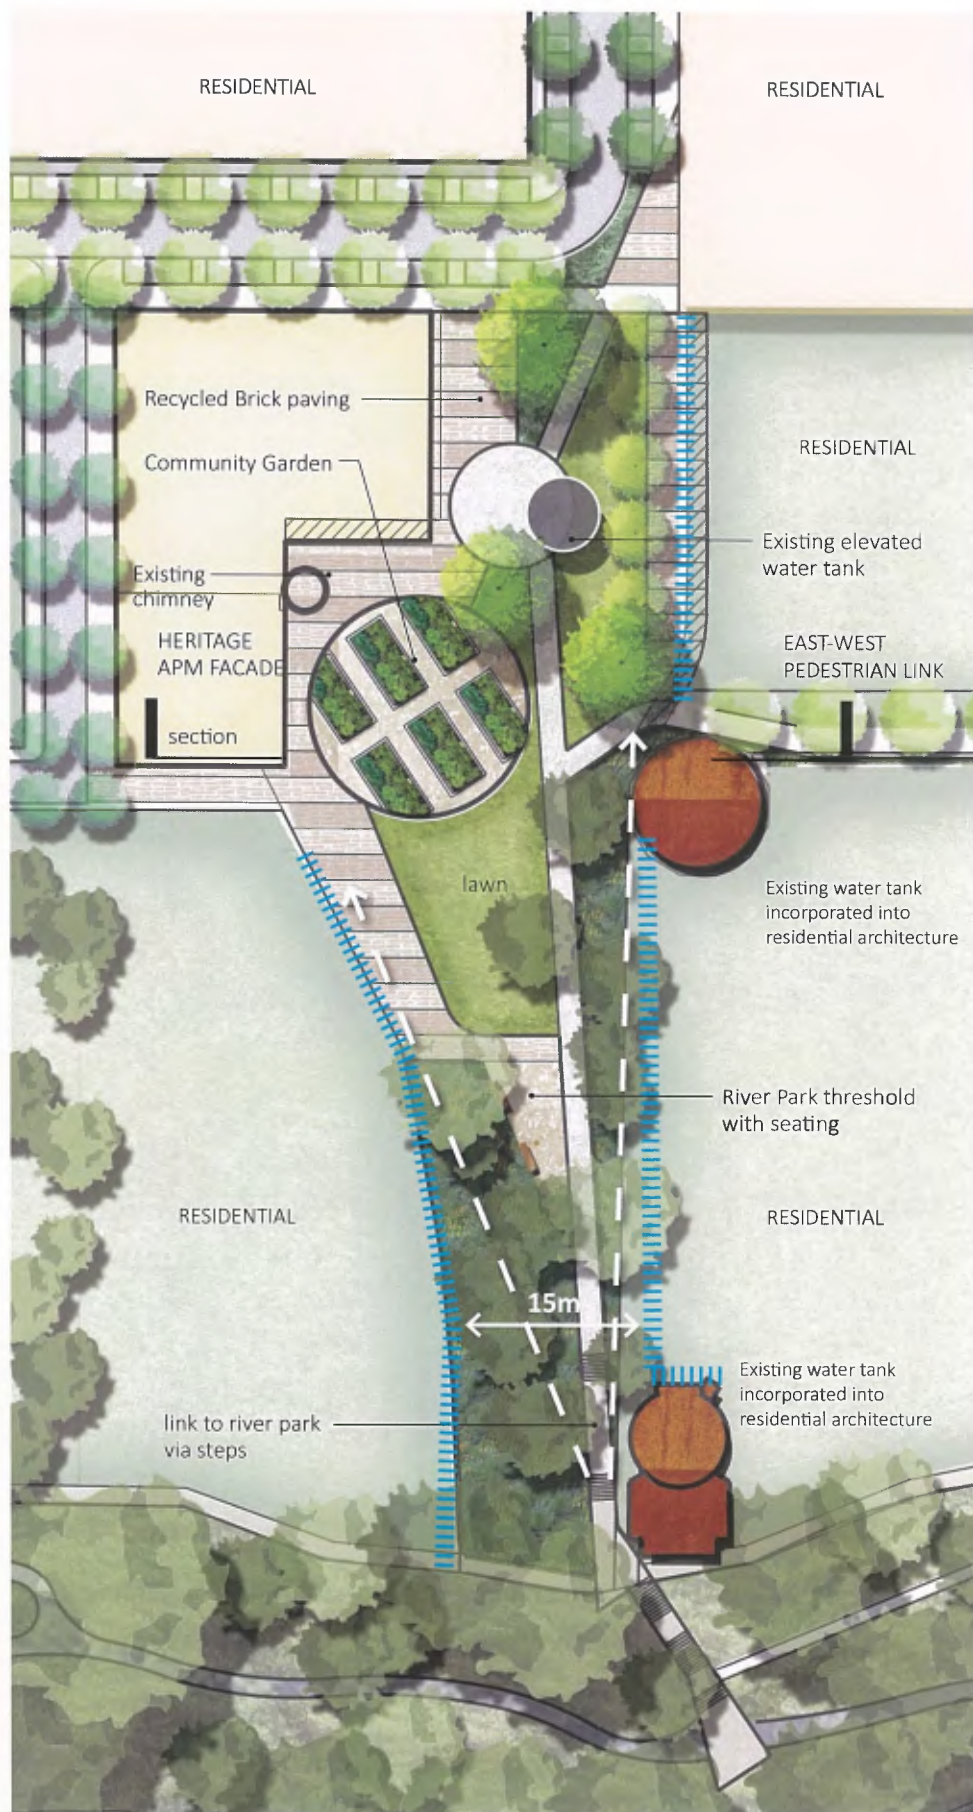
INDUSTRIAL HERITAGE PARK PLAN
